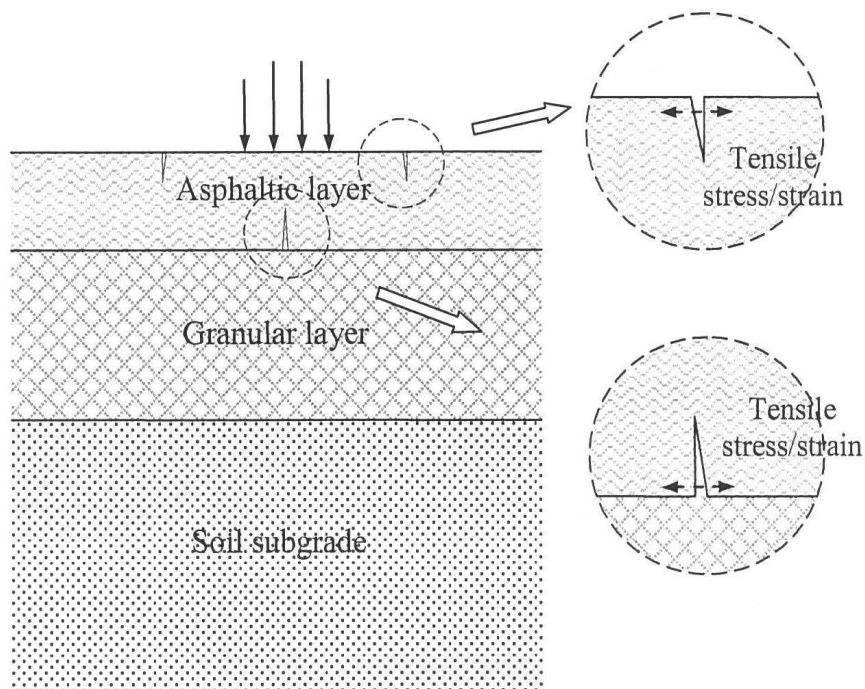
Illustration of fatigue cracking in road pavements (Wang, 2011)
